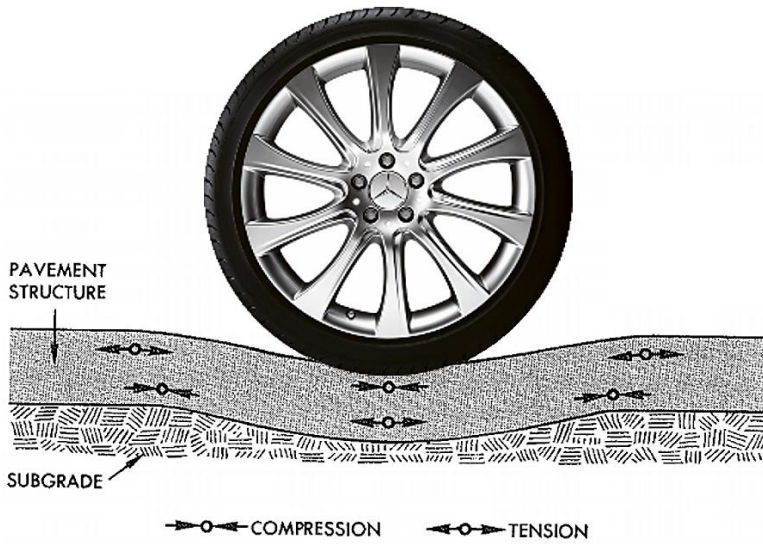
Pavement deflection in tensile and compressive stress in the pavement structure (IRC-37, 2021).
